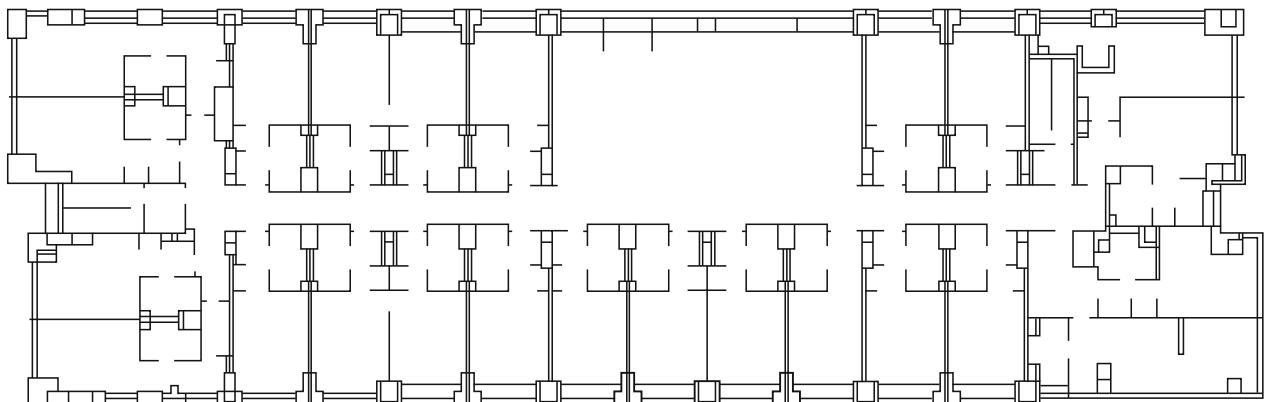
Floor plan of floors 1–10 (the hotel space)
